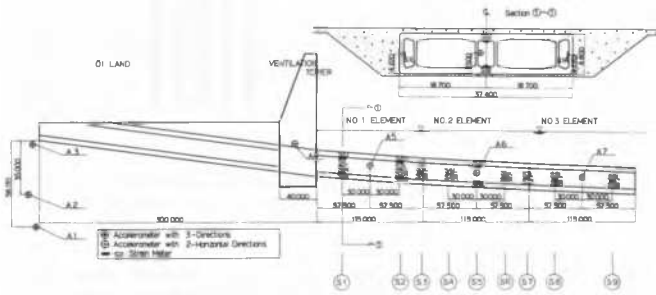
Sunken tunnel in Tokyo Bay (courtesy of Taisei Construction Co.)
